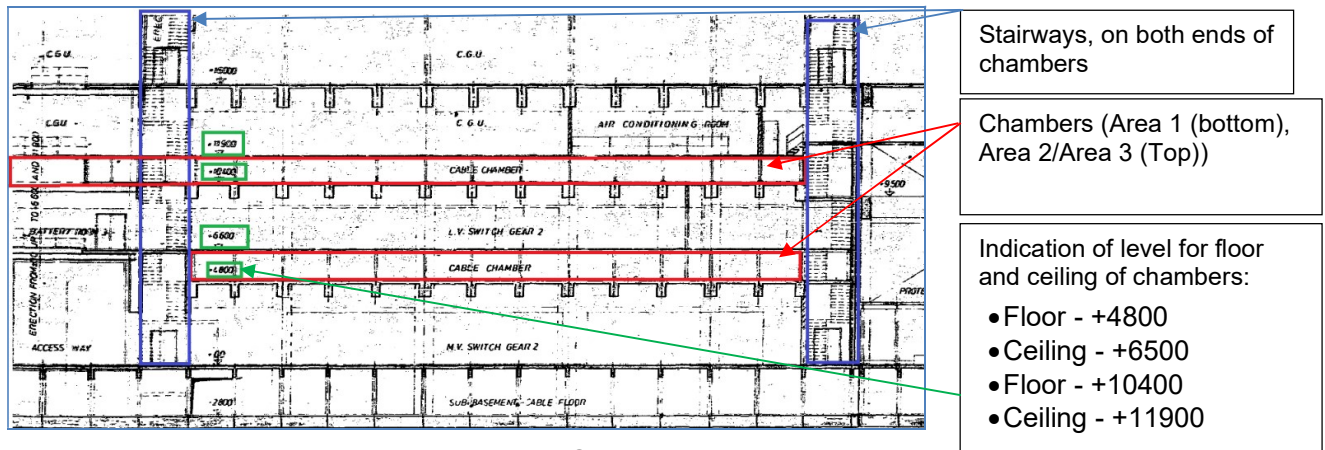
Unit 2 Auxiliary Bay Longitudinal Section (Drawing [13])
